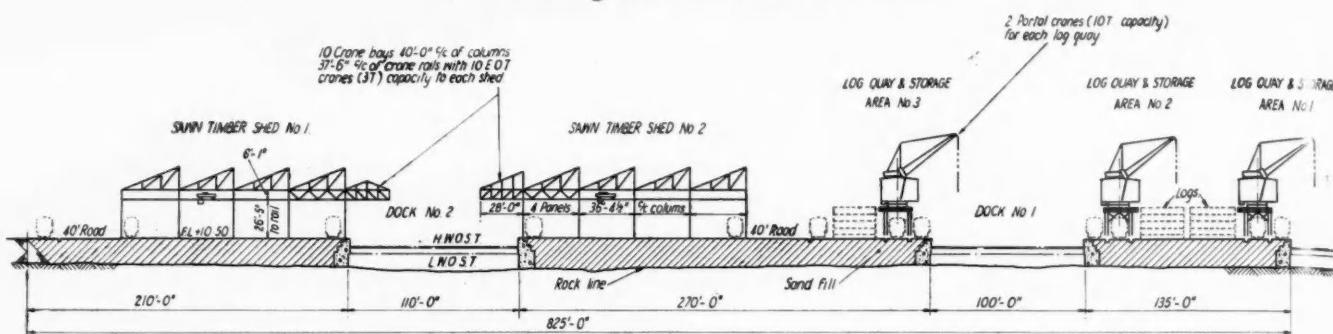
Section through Timber Depôt, Port of Takoradi.
